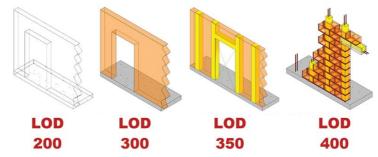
A masonry wall element LOD progression. (BIMForum, 2020)
